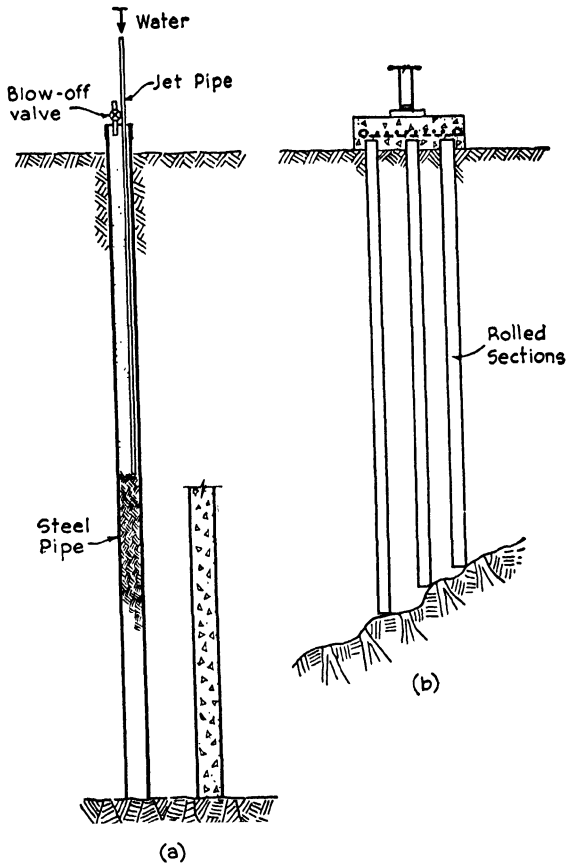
Steel Piles. (a) pipe; (b) structural shapes.
